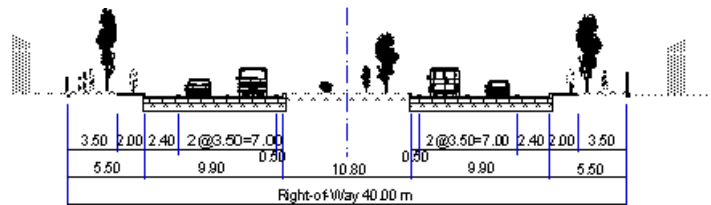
Proposed Cross Section for Av. Primeiro de Dezembro
